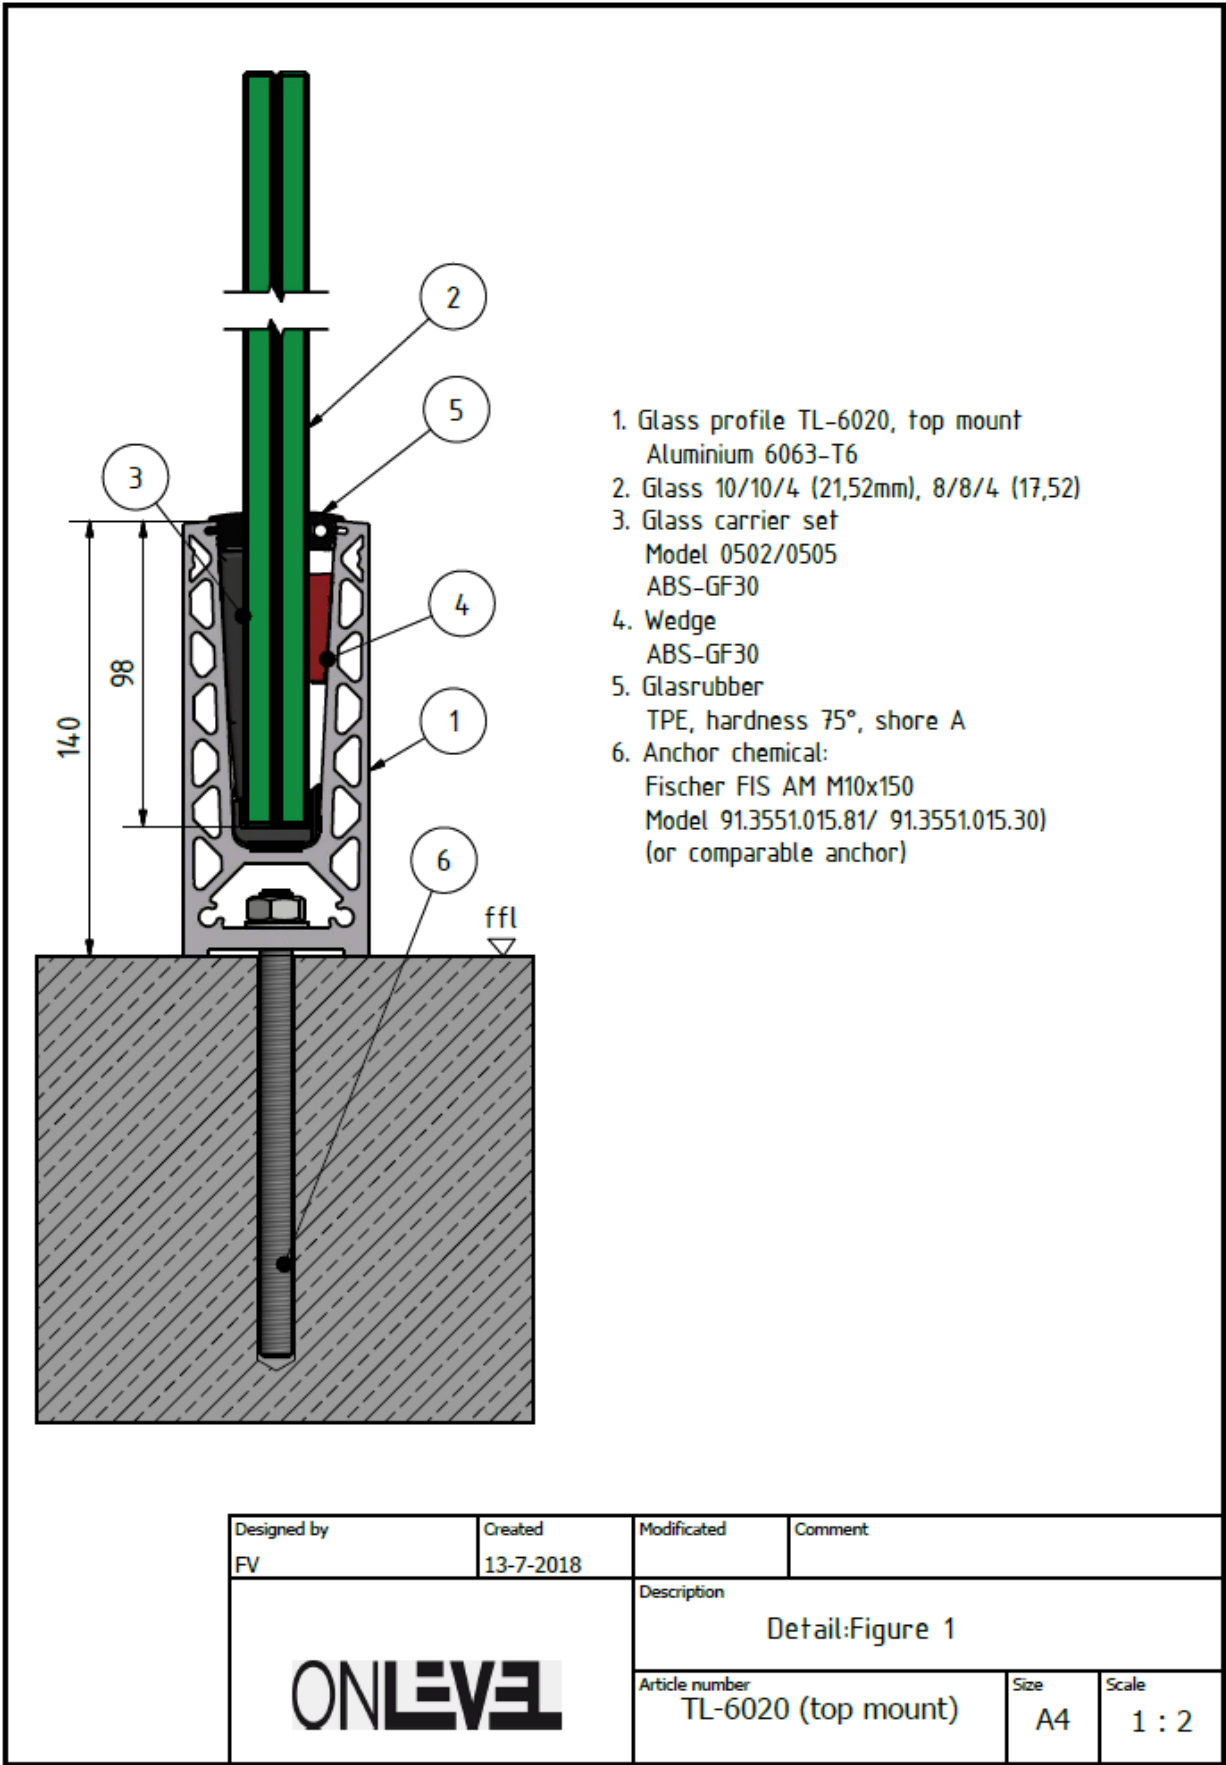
1. Product drawing from OnLevel for profile 6020 Top Mount – 1.5 kN/m, sheet 1 of 4.
